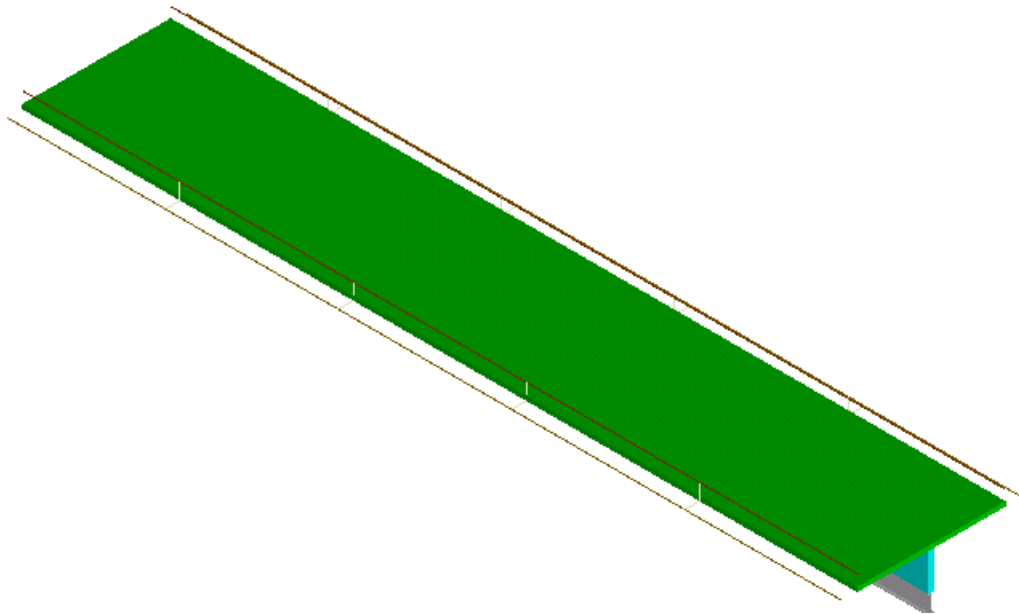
Constructed Condition Finite Element Model of a Center Panel
